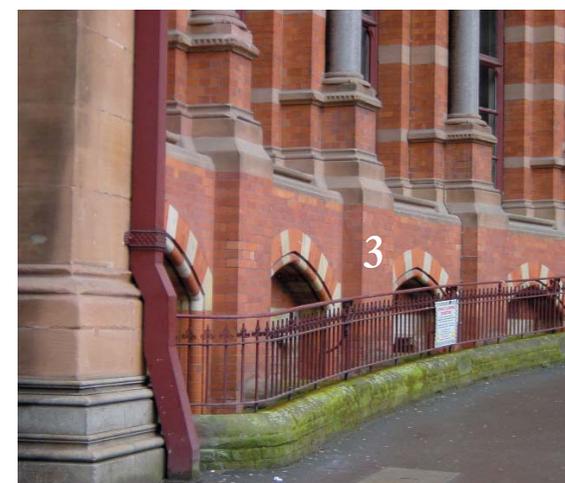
Area 3: overview and detail of the curved elevation onto Euston Road. Original brickwork showing black tuck pointing over red stopping mortar, confirming the black joint finish as the original finish throughout the building.
